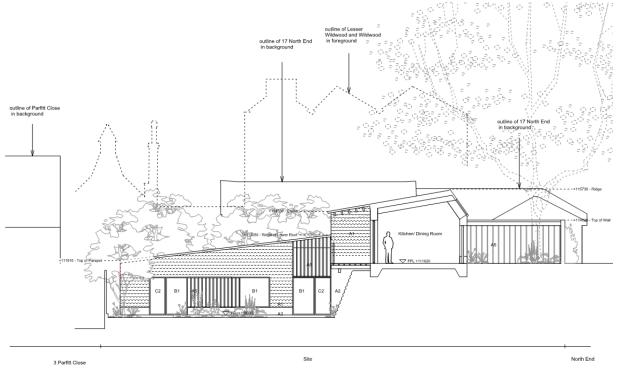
Proposed garden NW Elevation to boundary with 3 Parfitt Close
